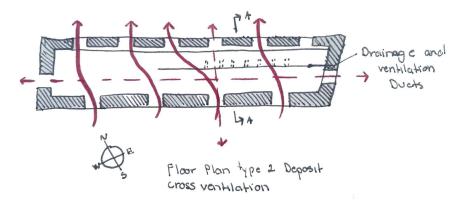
A plan of a rectangular type two *qollqa* in Ollantaytambo. Highlighting the cross ventilation and ducts. Drawing and annotation by the author, (redrawn from Jean-Pierre Protzen 2005, fig 5.19)
